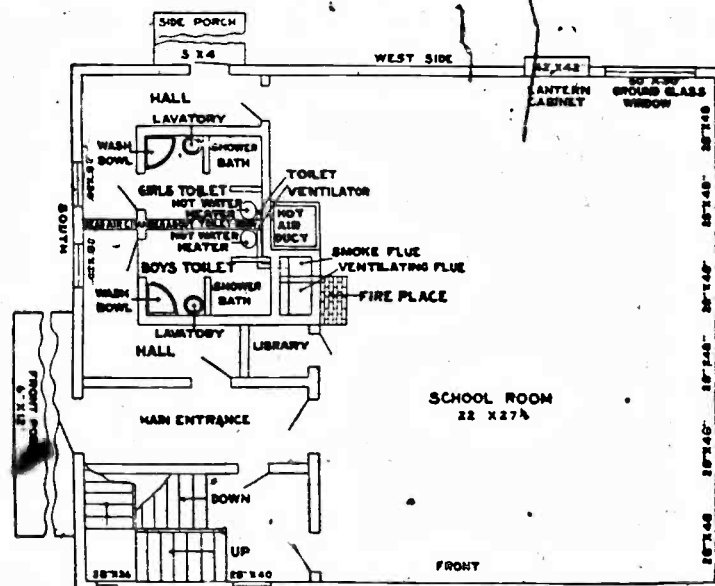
First floor plan, model rural school, Kirksville, Mo.
